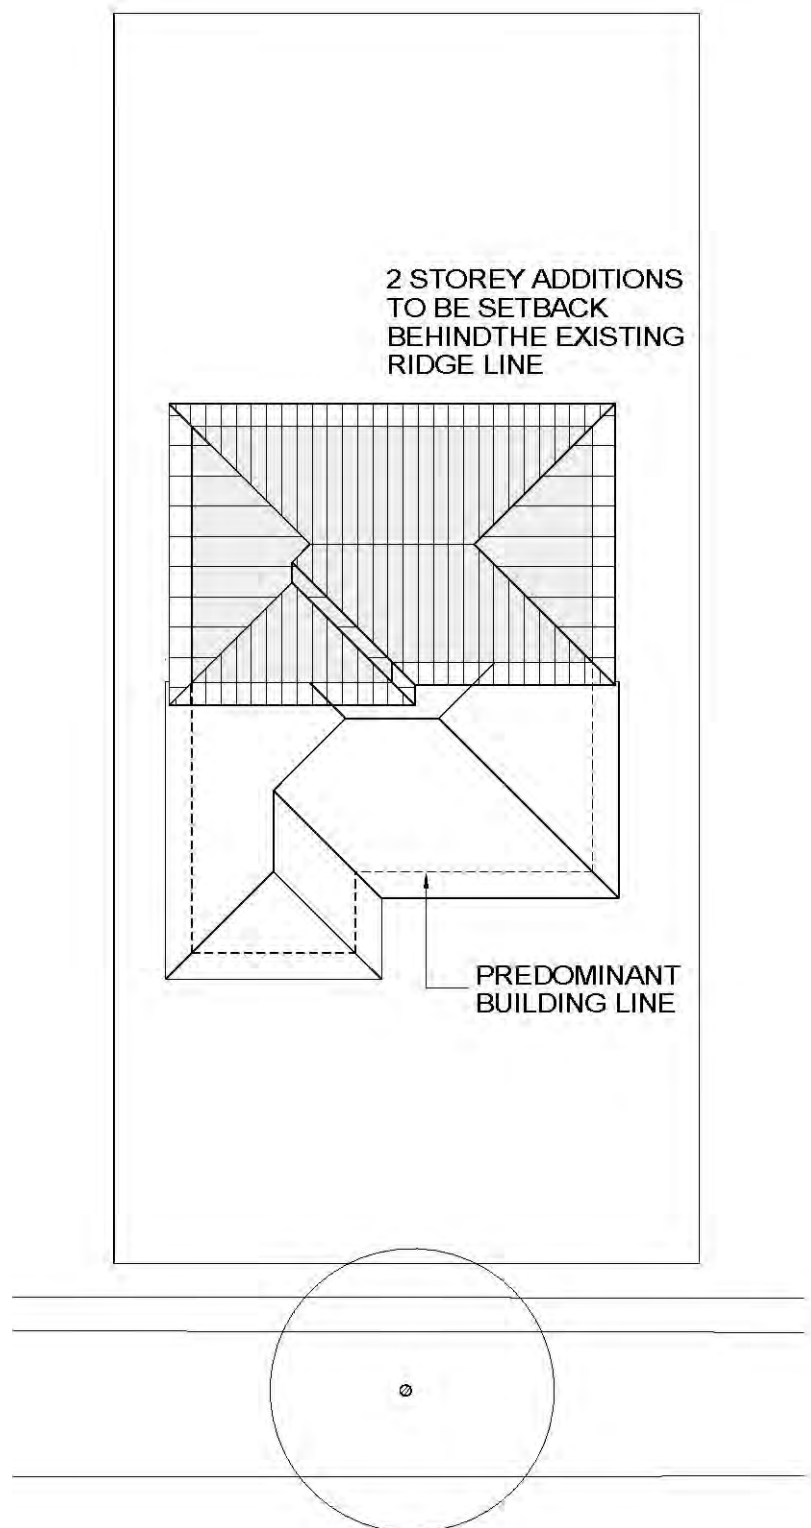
Plan Showing Second Storey Addition to Traditional House
